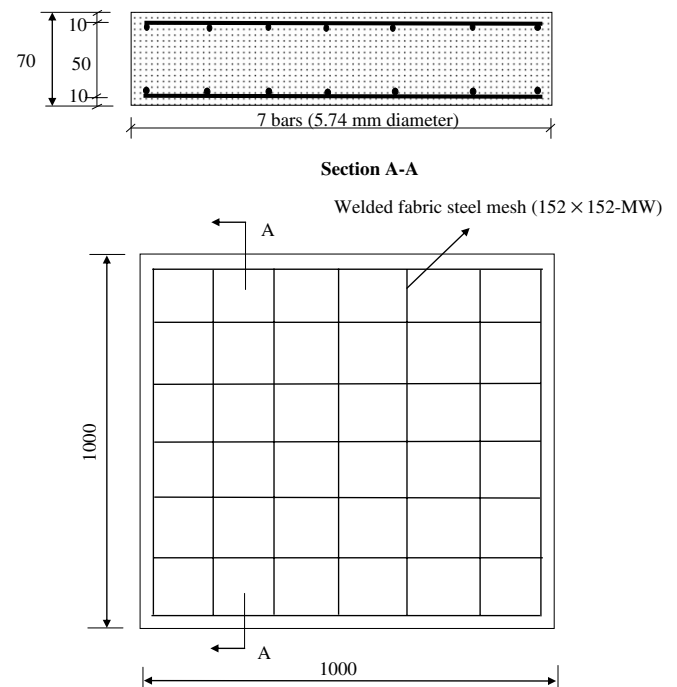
Test specimen geometry and reinforcement details (all dimensions in mm).
